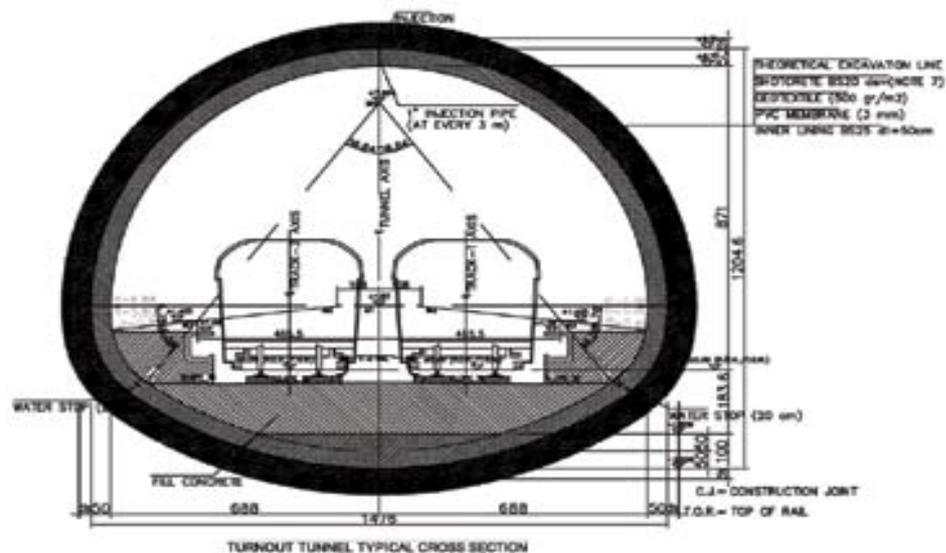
Turnout tunnel cross-section (Türkerler-Limak, 2004)
